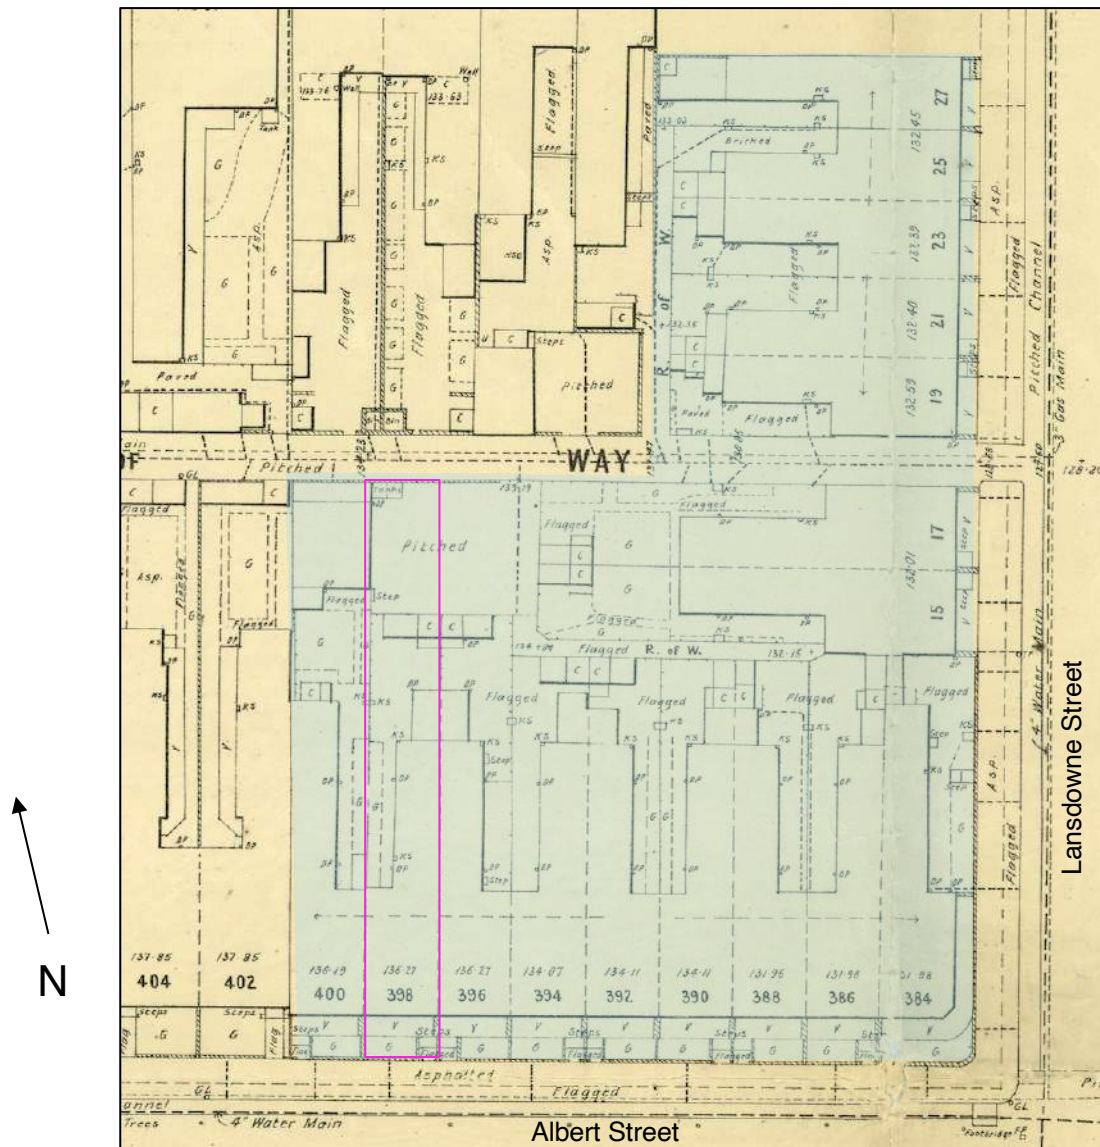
c. 1899 MMBW Plan extract showing the original layout with Burlington Terrace shaded in blue, the subject site (398) outlined in pink.
